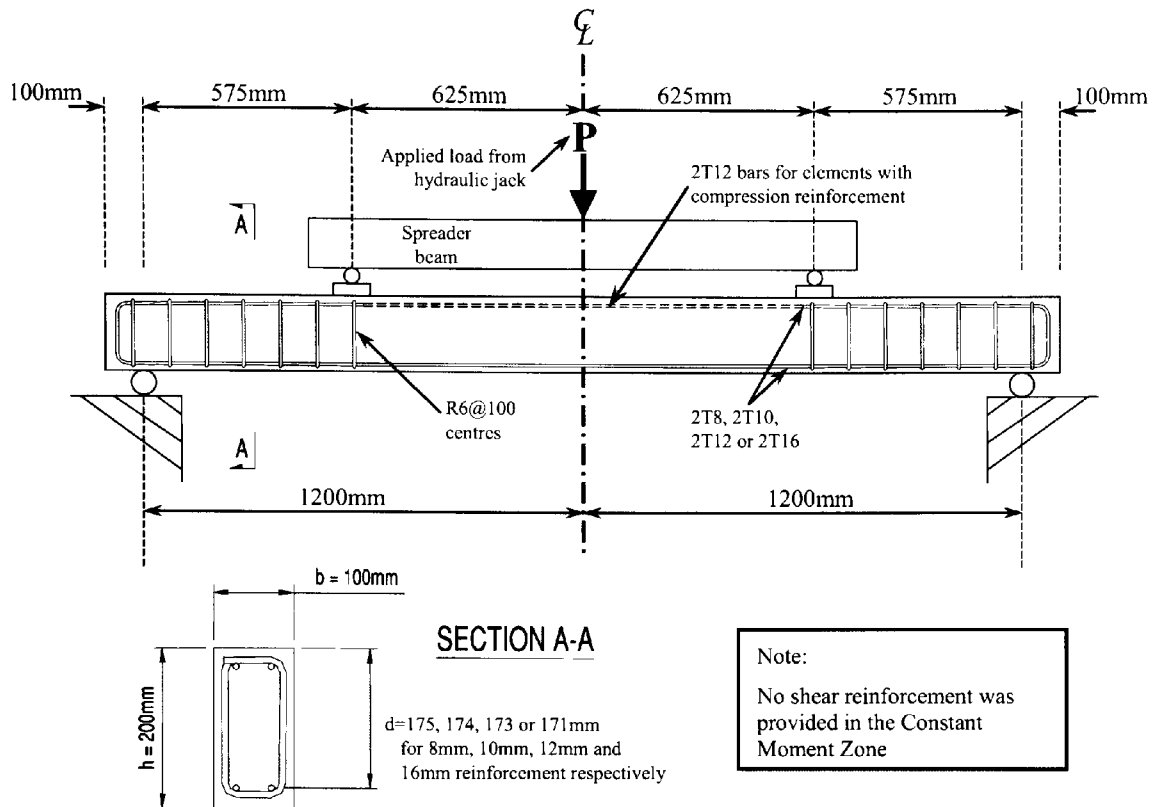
Beam dimensions and internal reinforcement arrangement
